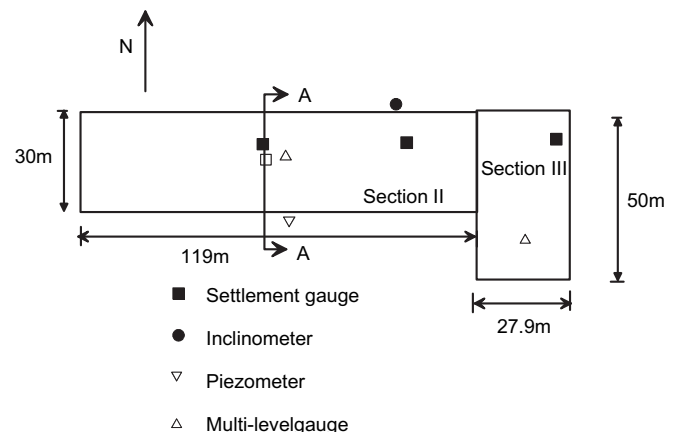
Embankment plan view with field instrumentation (after Chu and Yan, 2005).
